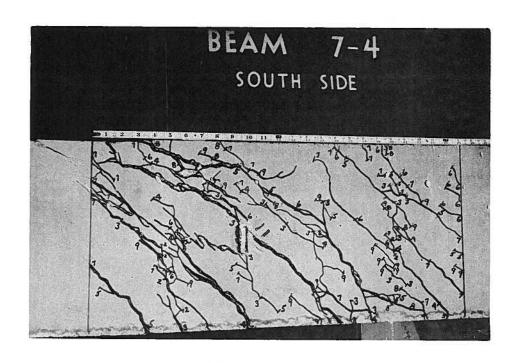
3 CRACK PATTERN OF BEAM 7 - 4
